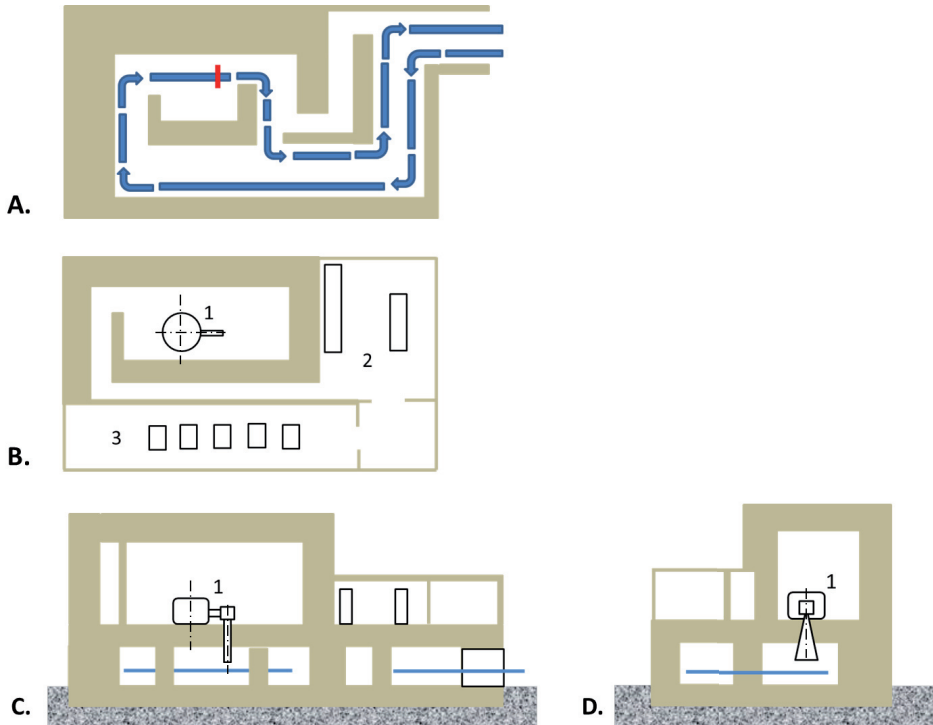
Possible layout of conveyor system and shielding wall configuration in facility equipped with RF multipass resonance accelerator: 1 – accelerator, 2 – control room, 3 – auxiliary equipment room. A – ground floor layout; B – first floor layout; C, D – side view
